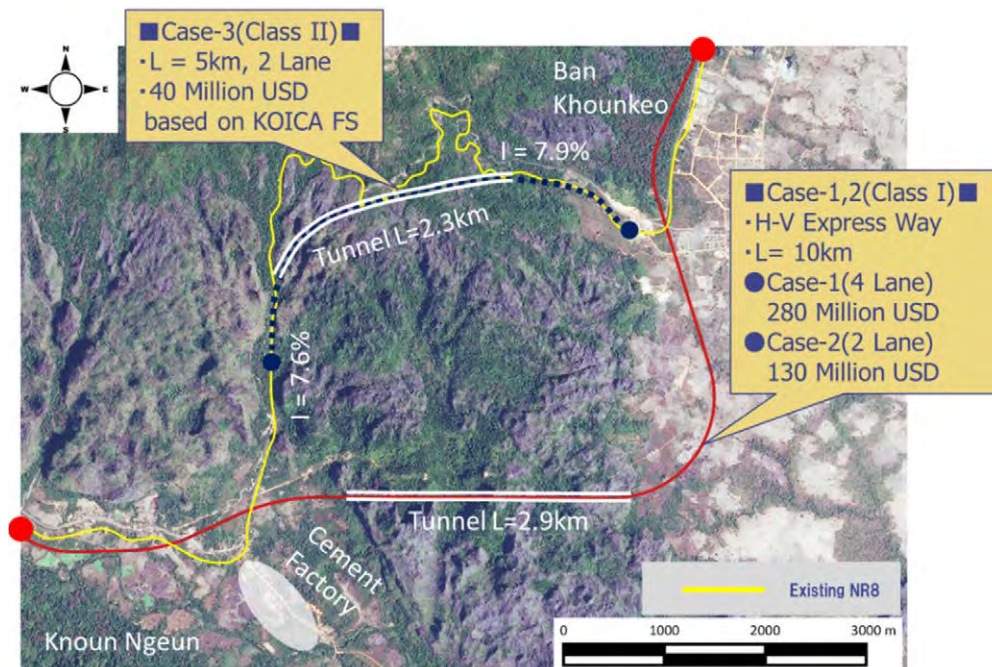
Improvement of NR 8 Route (tunnel through mountainous sections 1)
